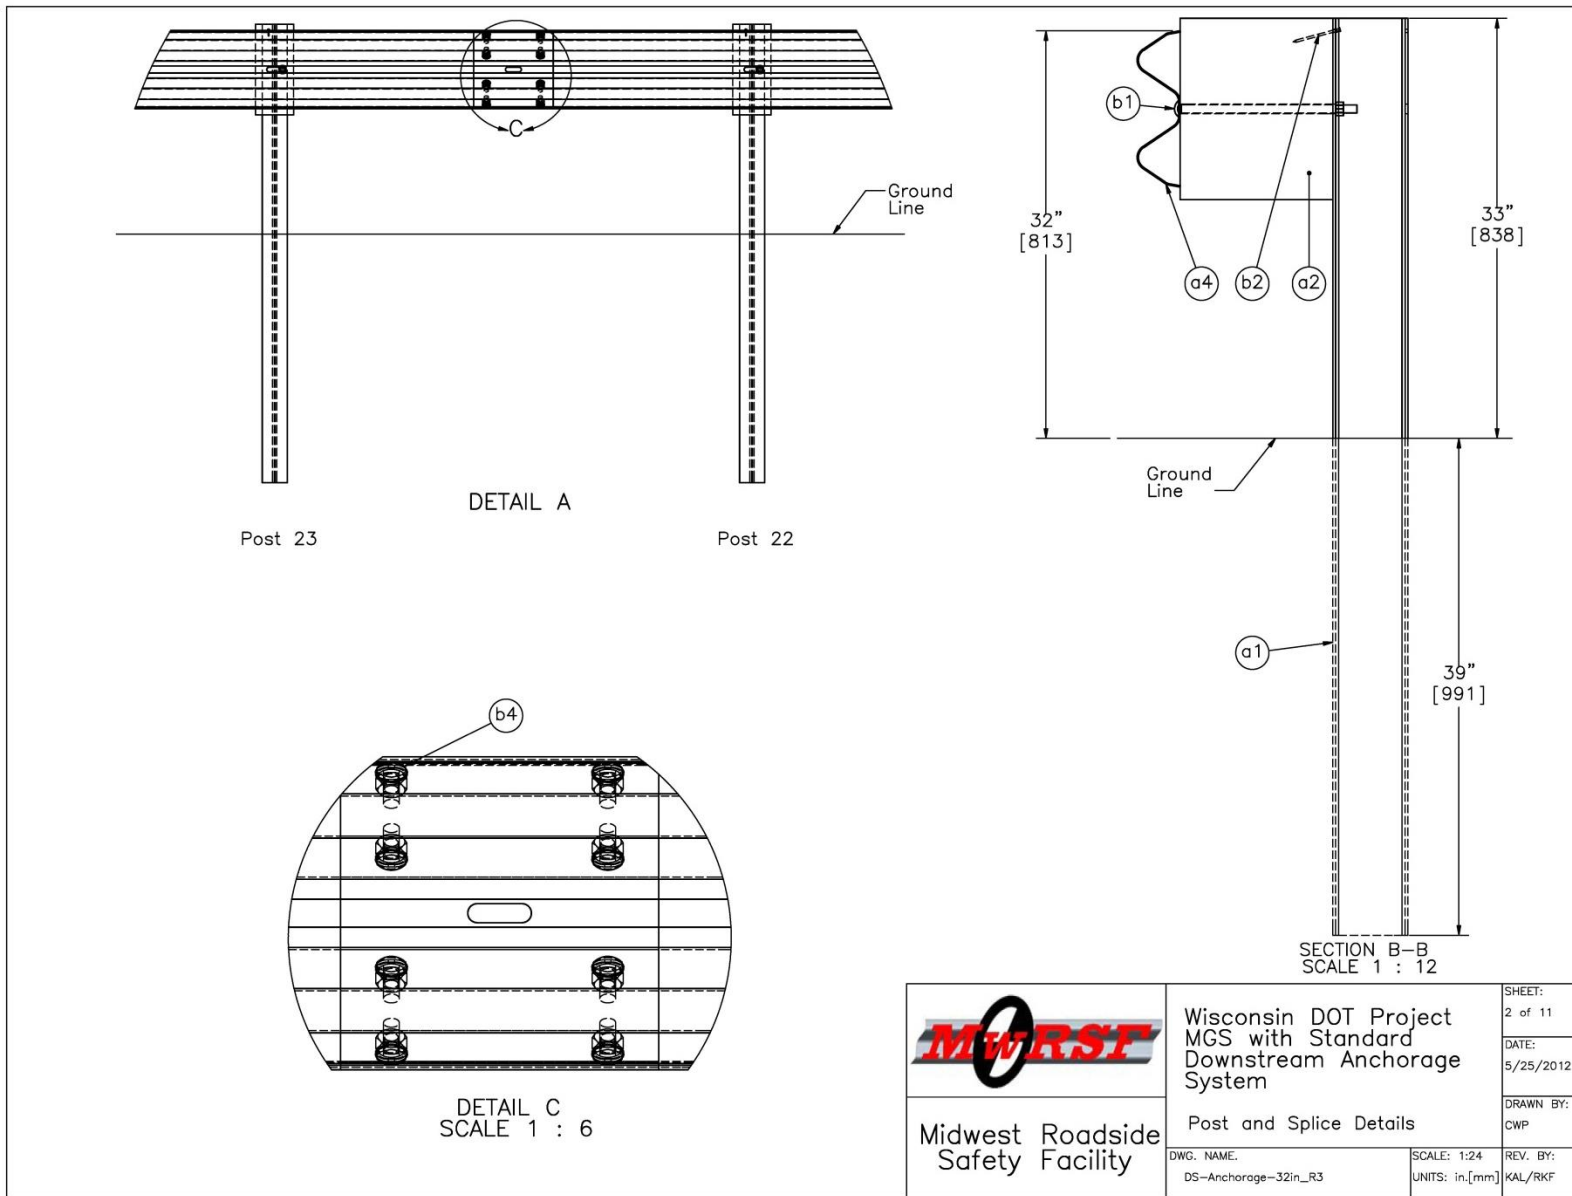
32-in. (813-mm) Tall Blocked MGS Details, Test No. WIDA-2
